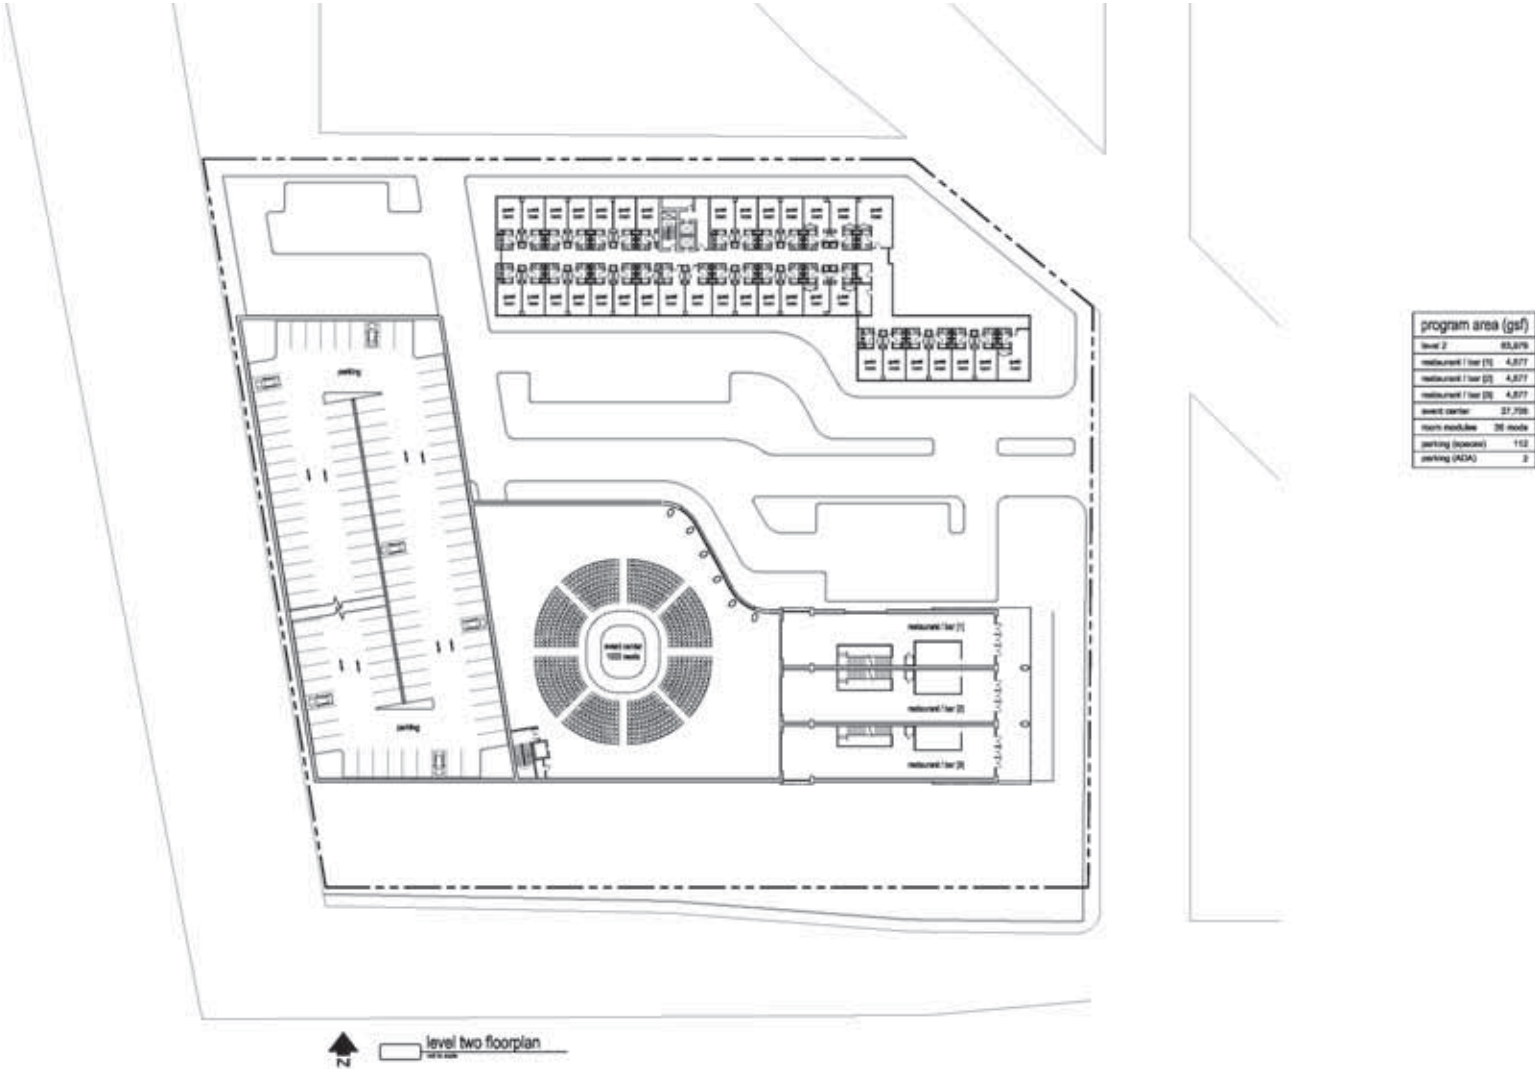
EXHIBIT B: LEVEL 2 FLOOR PLAN (MEZZANINE)
